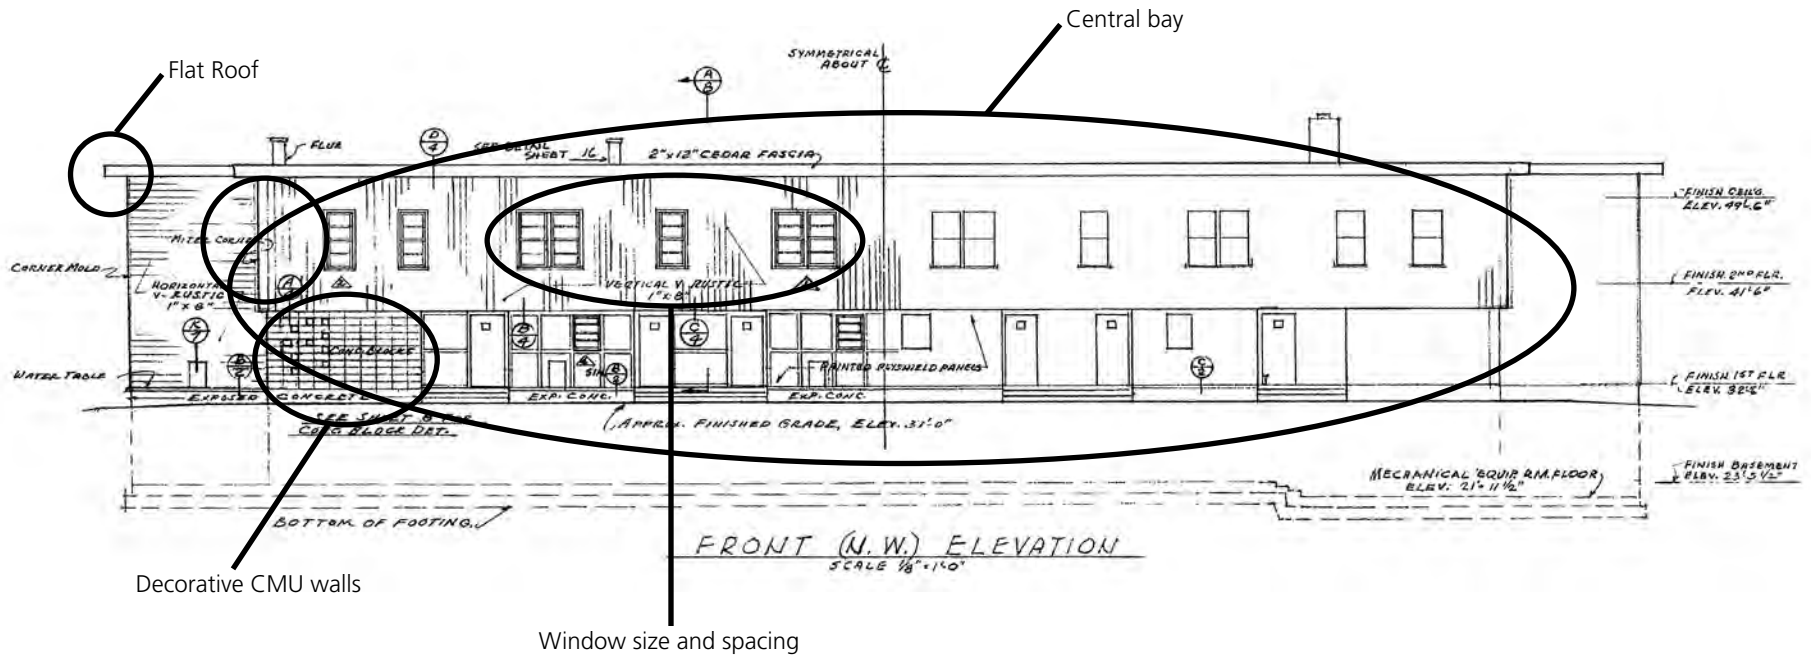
Building 51, 1960, As-Constructed Drawings, ETIC
